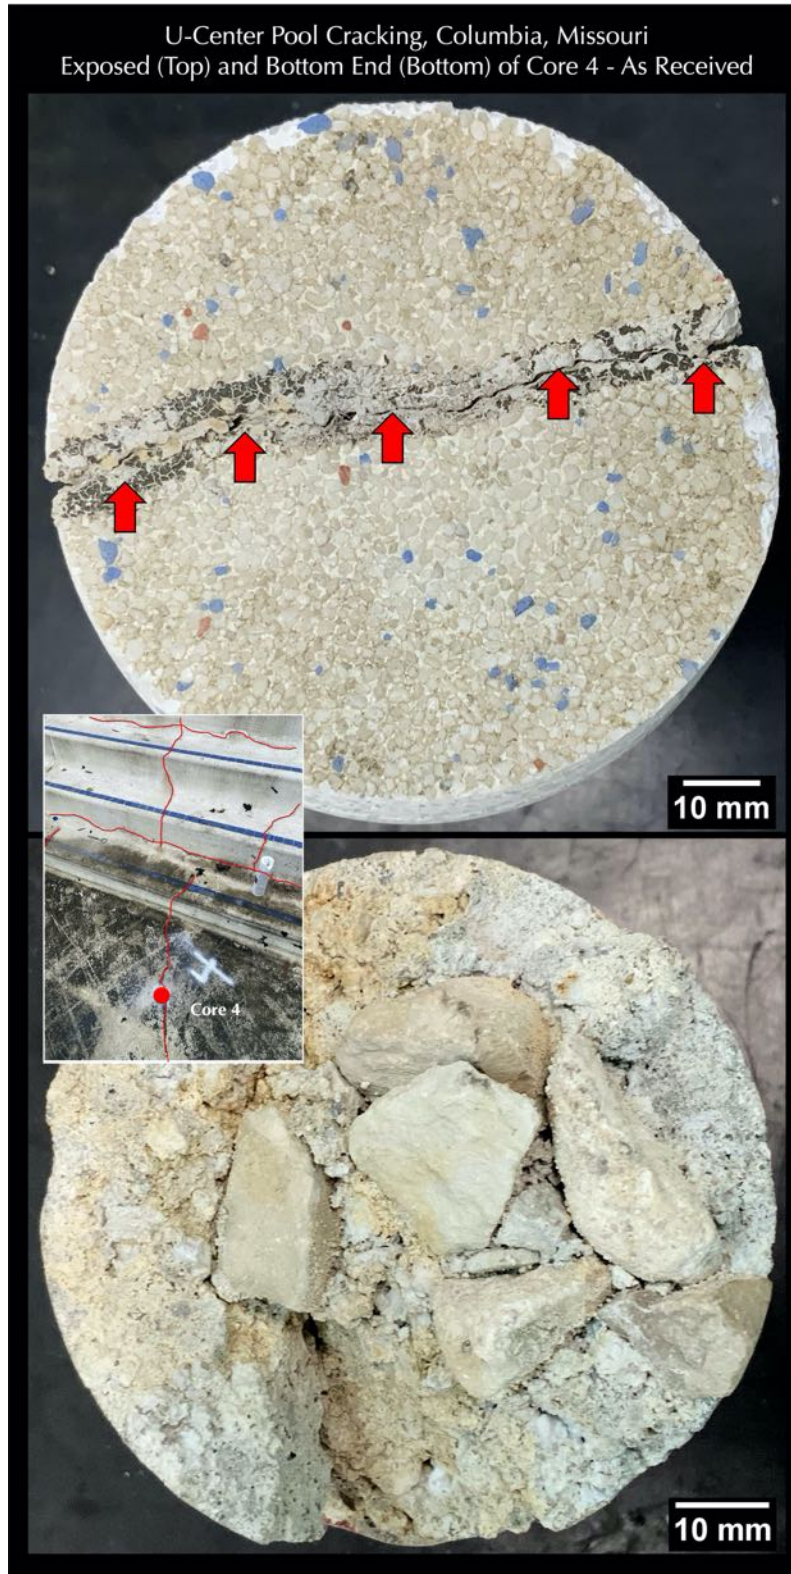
Shown are the top exposed surface of pool plaster with a crack that has been attempted to seal with a repair caulk but has cracked again through the seal (top) and underside of shotcrete with adhered crushed stone beneath the pool floor slab (bottom) in Core 4. Inset photo shows location of Core 4 on the floor of pool.
